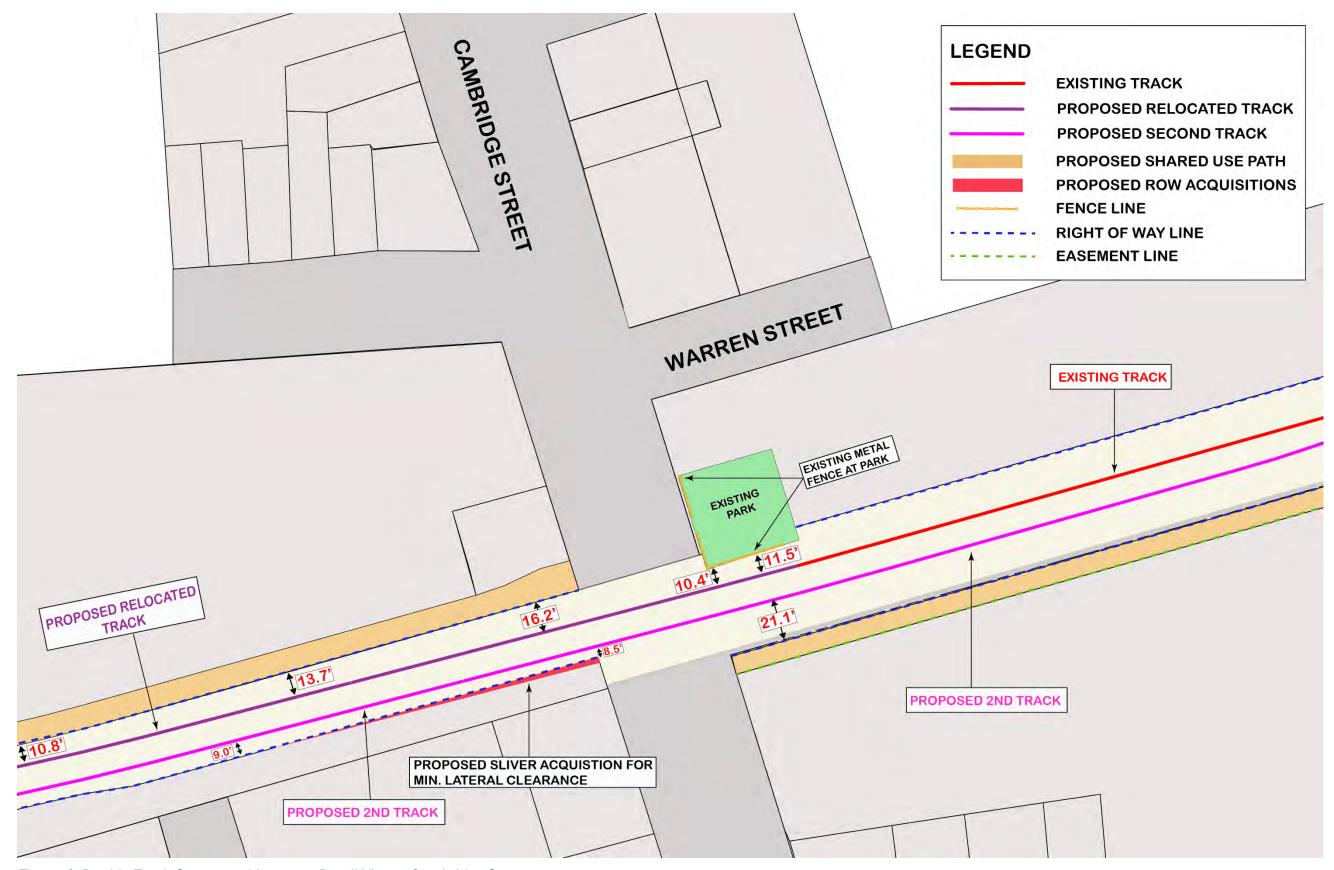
Double-Track Conceptual Layout – Detail View – Cambridge Street
